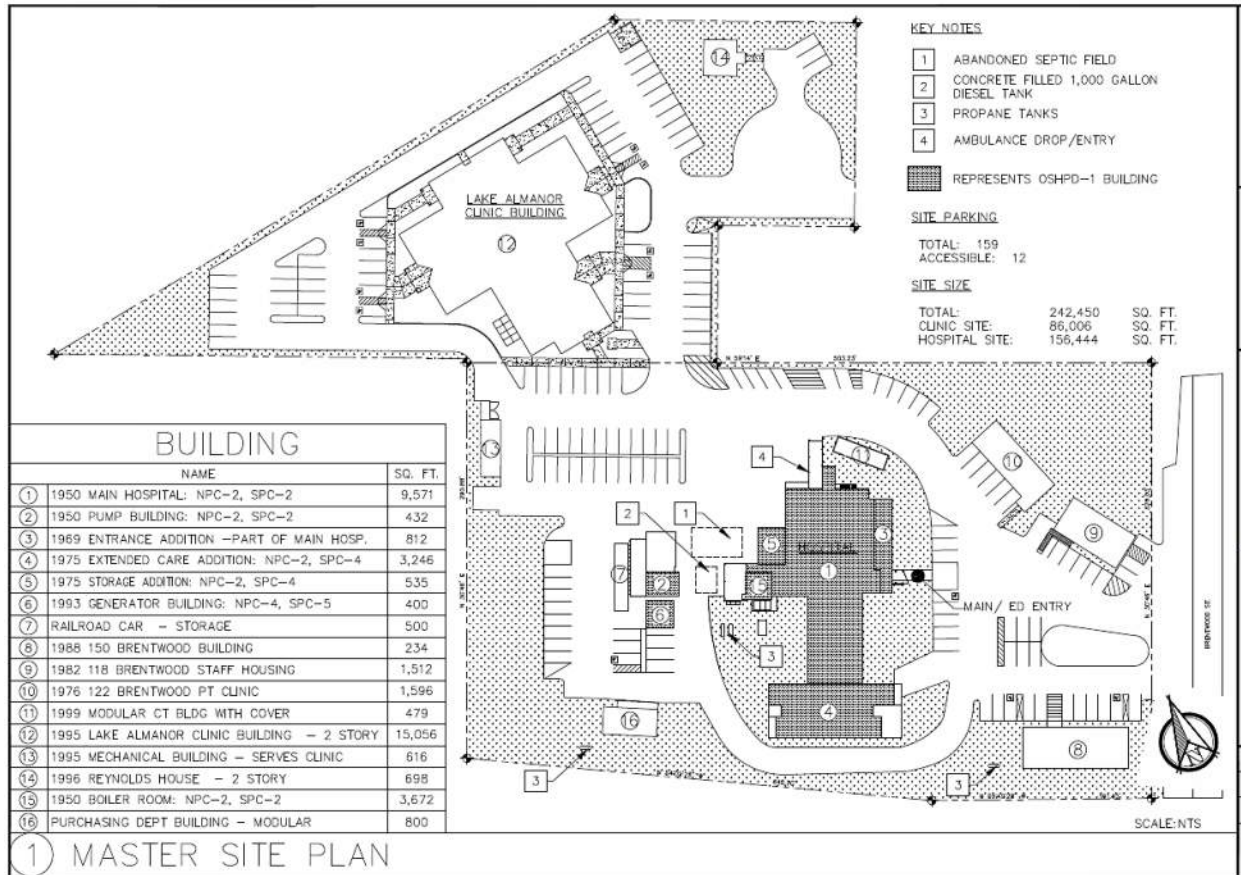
SHD site plan with labeled buildings, prepared by Aspen Street Architects for the 2019 Master Plan.
